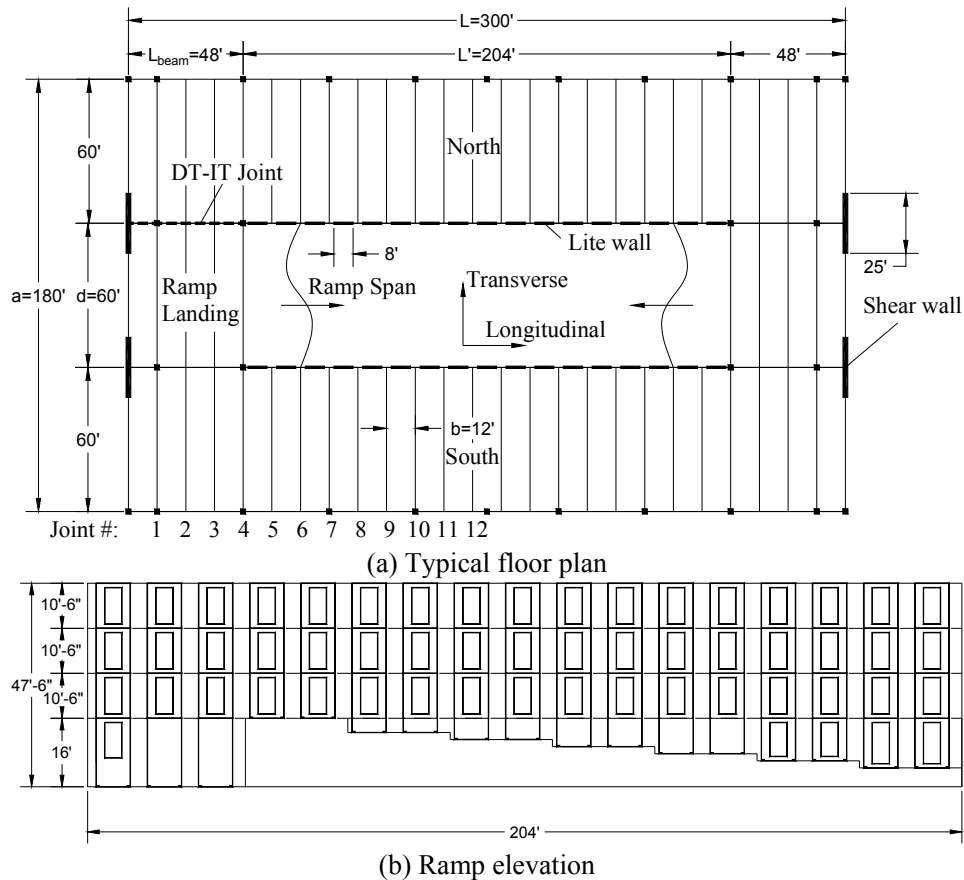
Example 1 Structure: 4-story perimeter wall parking garage.
